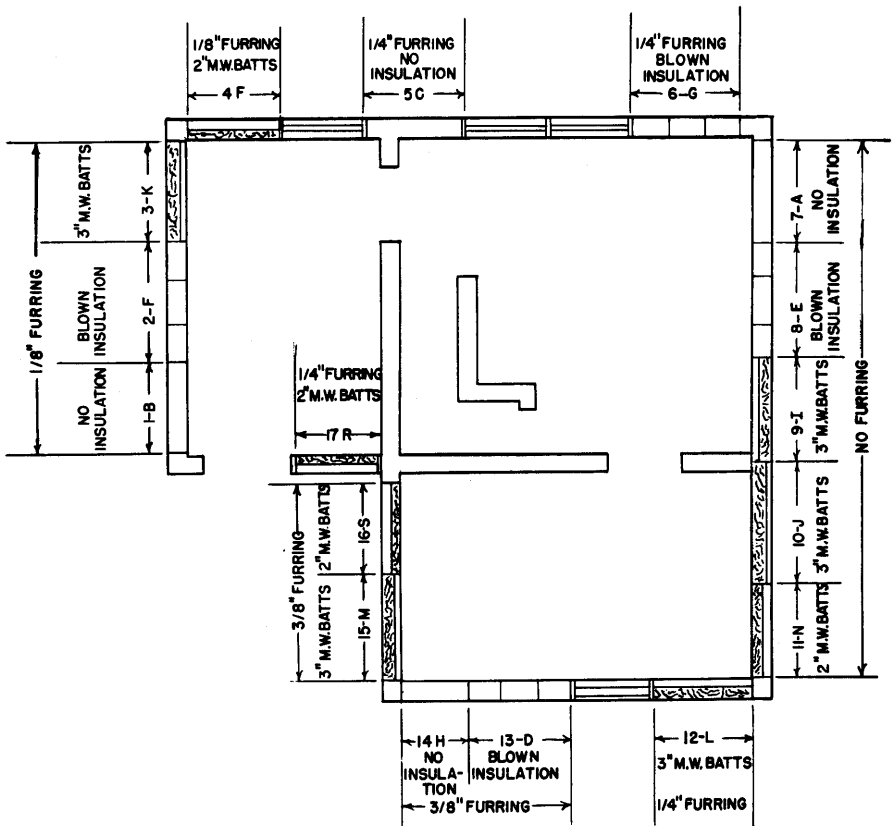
Plan View of Bungalow Showing Location of Wall Panels
